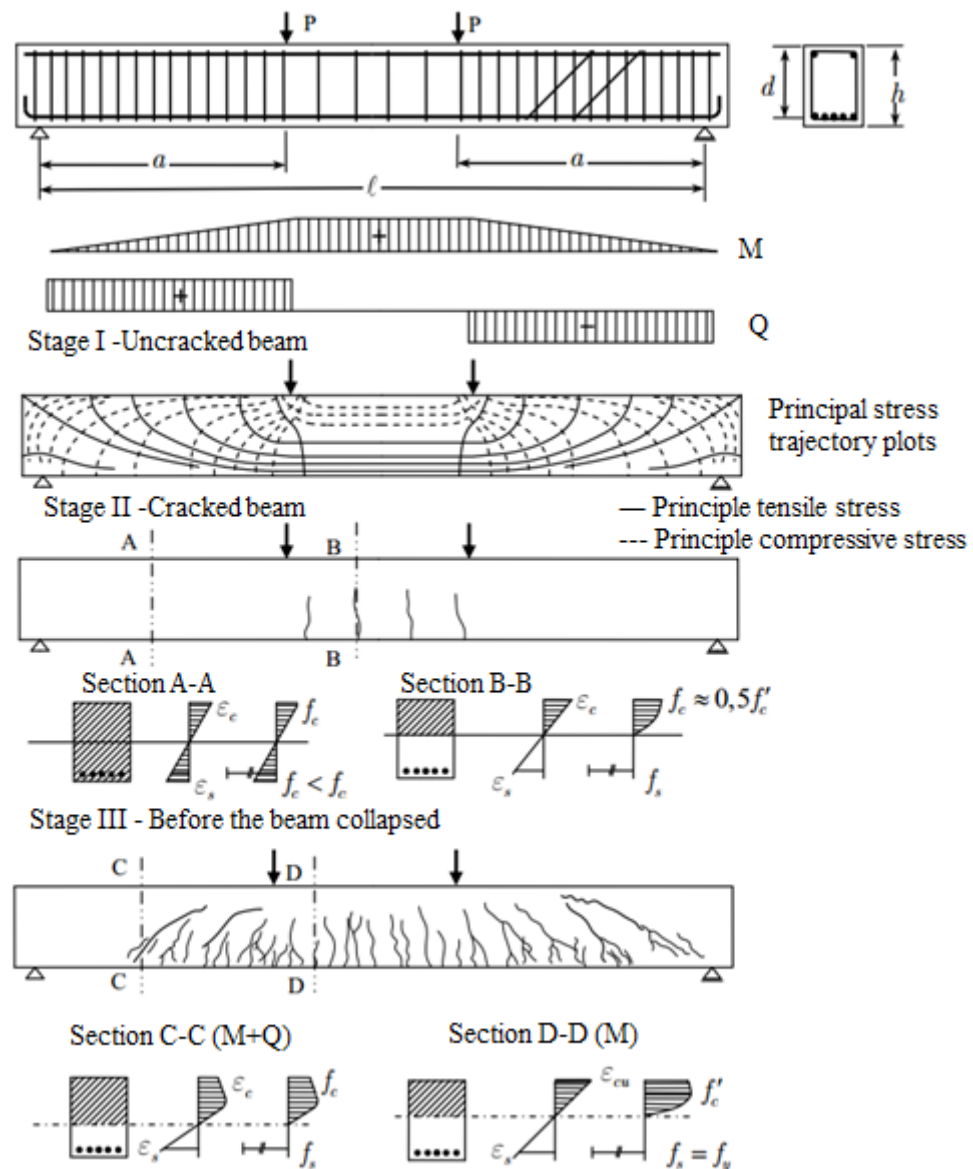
The stage of section RC beam loaded by bending to failure [15]
